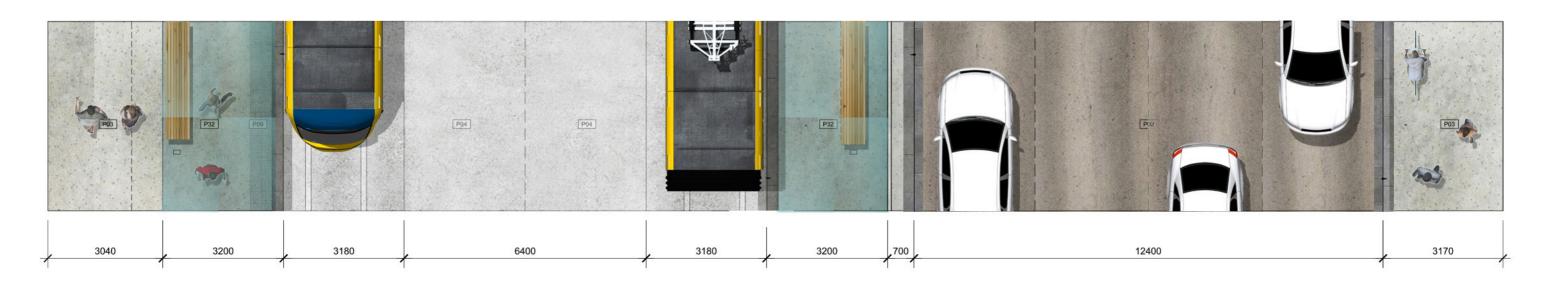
Partial plan and section of Fanshawe Street at Fanshawe Stop looking east
